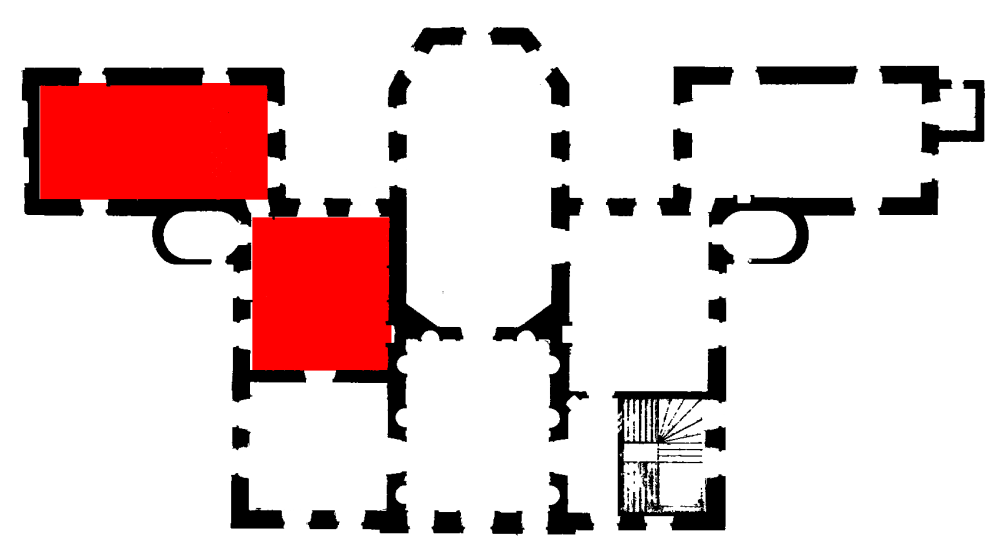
The Bieleński Palace floor plan. The investigated rooms shown in red.
